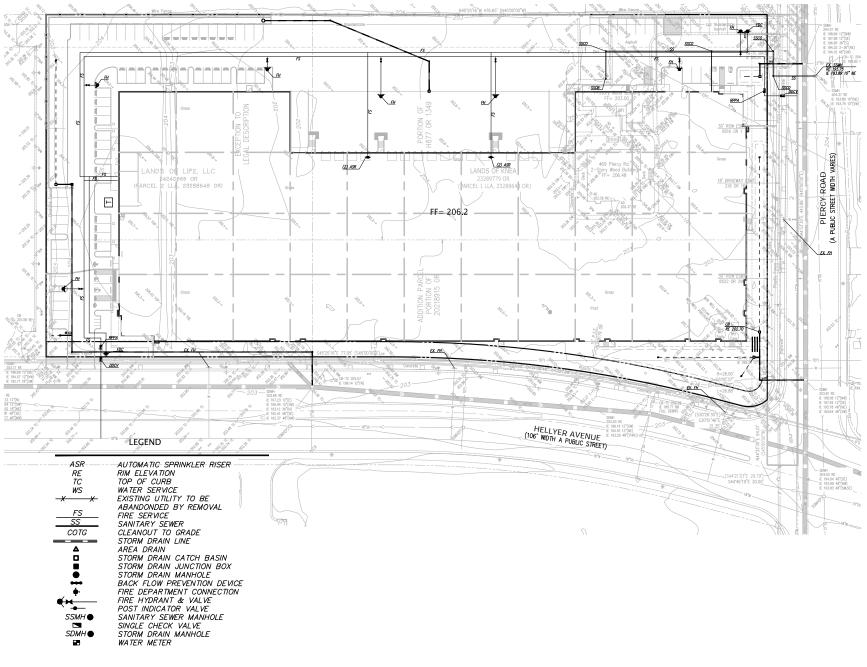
Preliminary Stormwater Quality Control Plan 469 Piercy Road Project Initial Study
